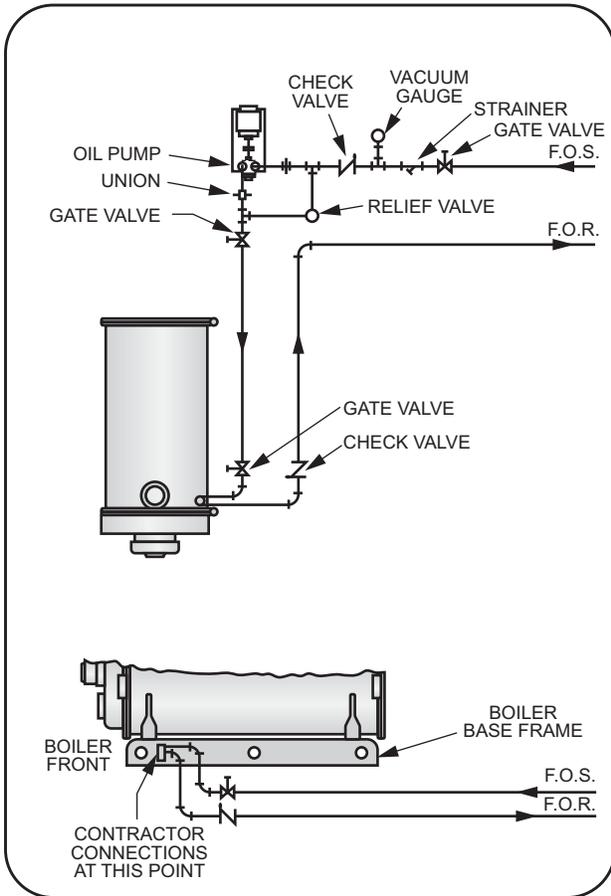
No. 2 Oil Piping, Single Boiler Installation, Remote Oil Pump
